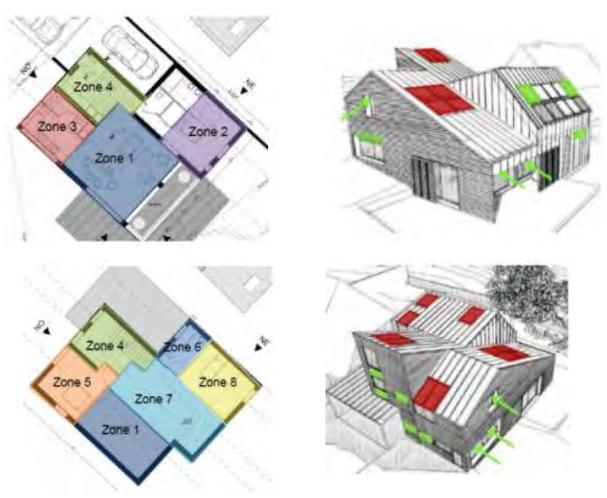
NATURAL VENTILATION SYSTEM: ZONES, INLET AND OUTLET WINDOWS
